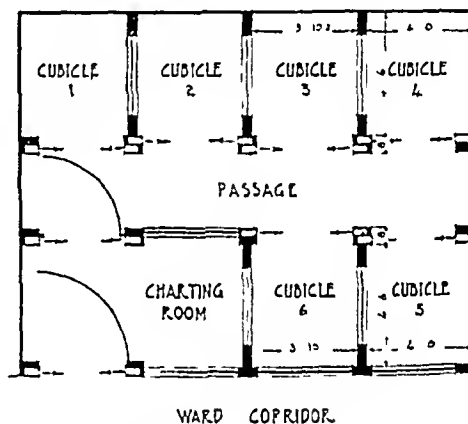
Plan of room equipped with ultraviolet lamps. Arrows show direction of ultraviolet rays.
